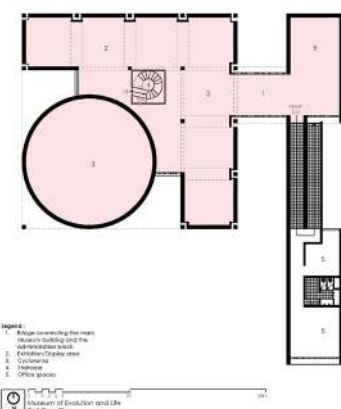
b: First Floor Plan of the Museum showing the closed façade
